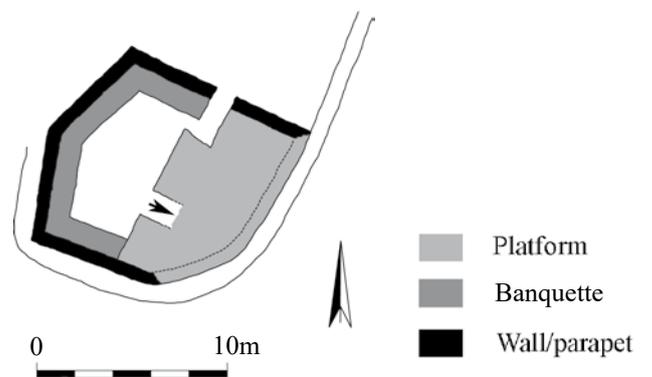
Murrat Wells. The redoubt, measured sketch plan (scale 1:400).
